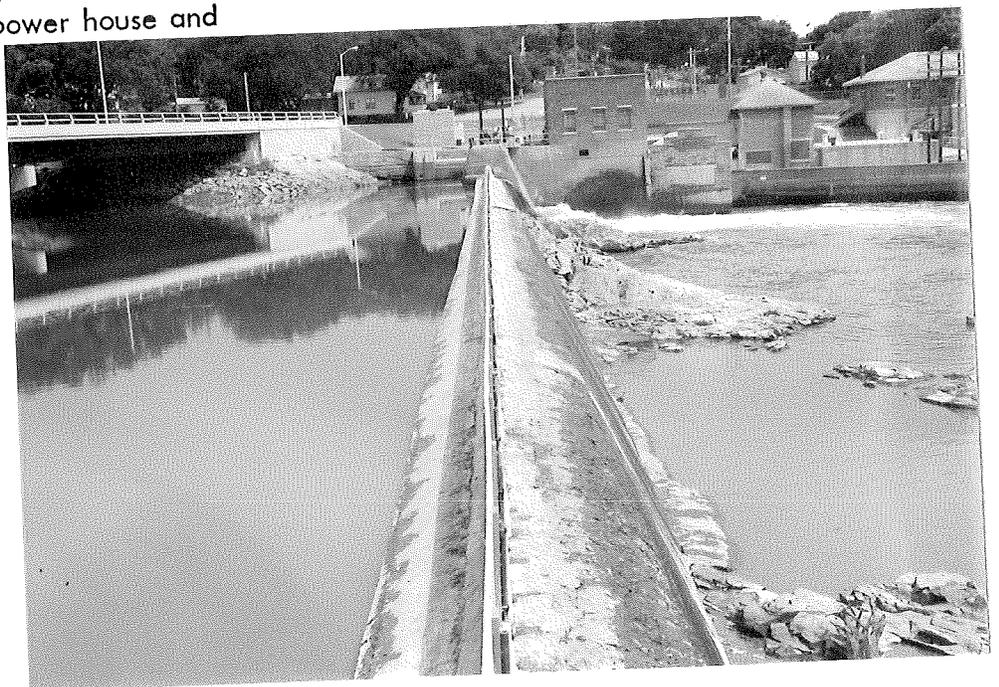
Right downstream face of dam showing cold joints and wood flash boards in place on dam crest.
